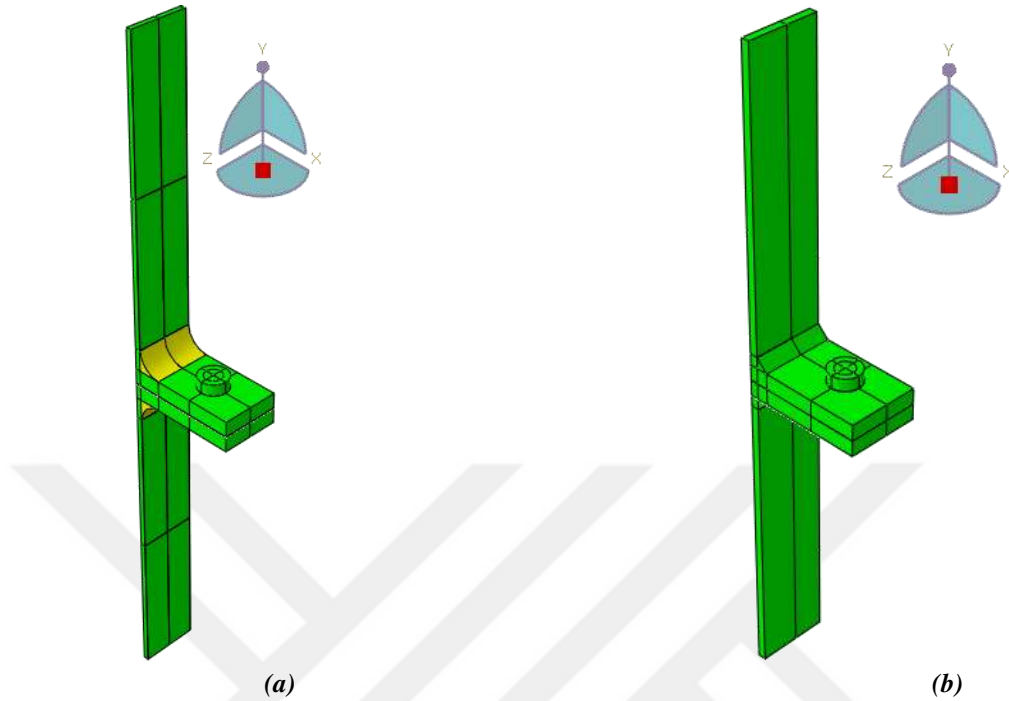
Meshing techniques for (a) specimen T1 and (b) specimen WT1
